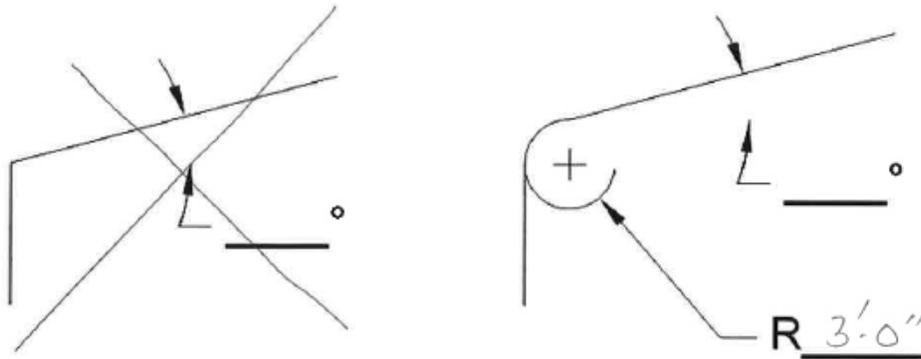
Reservoir Roof Edge – Select appropriate figure and sketch roof edge configuration.
